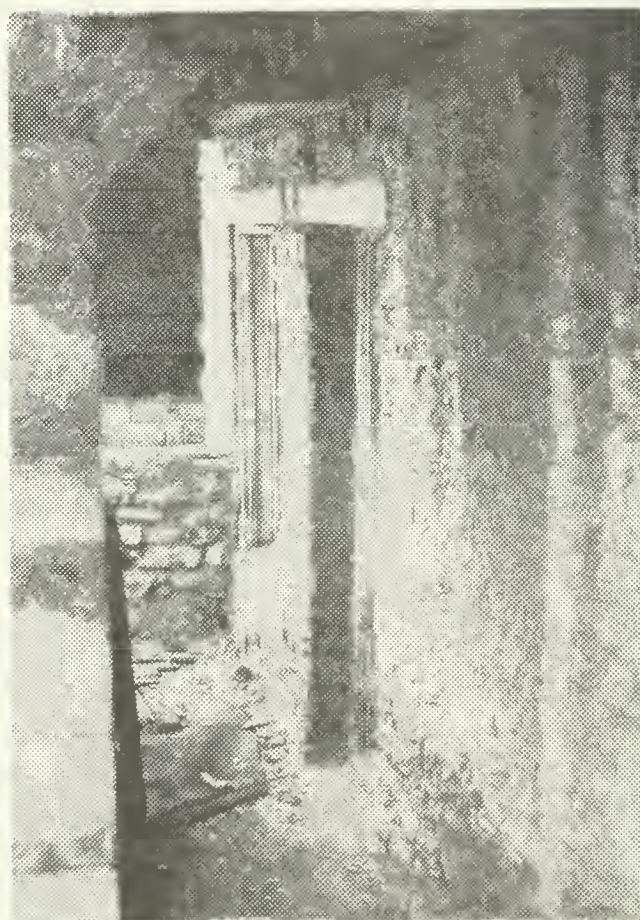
B. First Floor Front Entrance to the B Street House in 1980. View is to the North.
